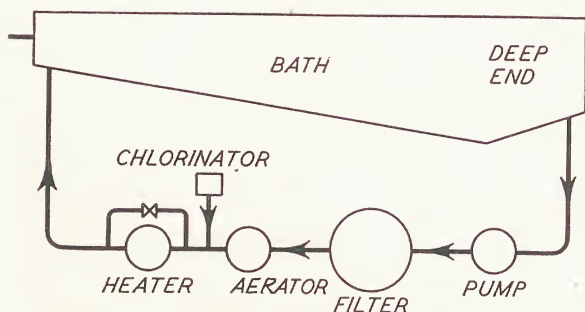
SWIMMING-BATH EQUIPMENT
